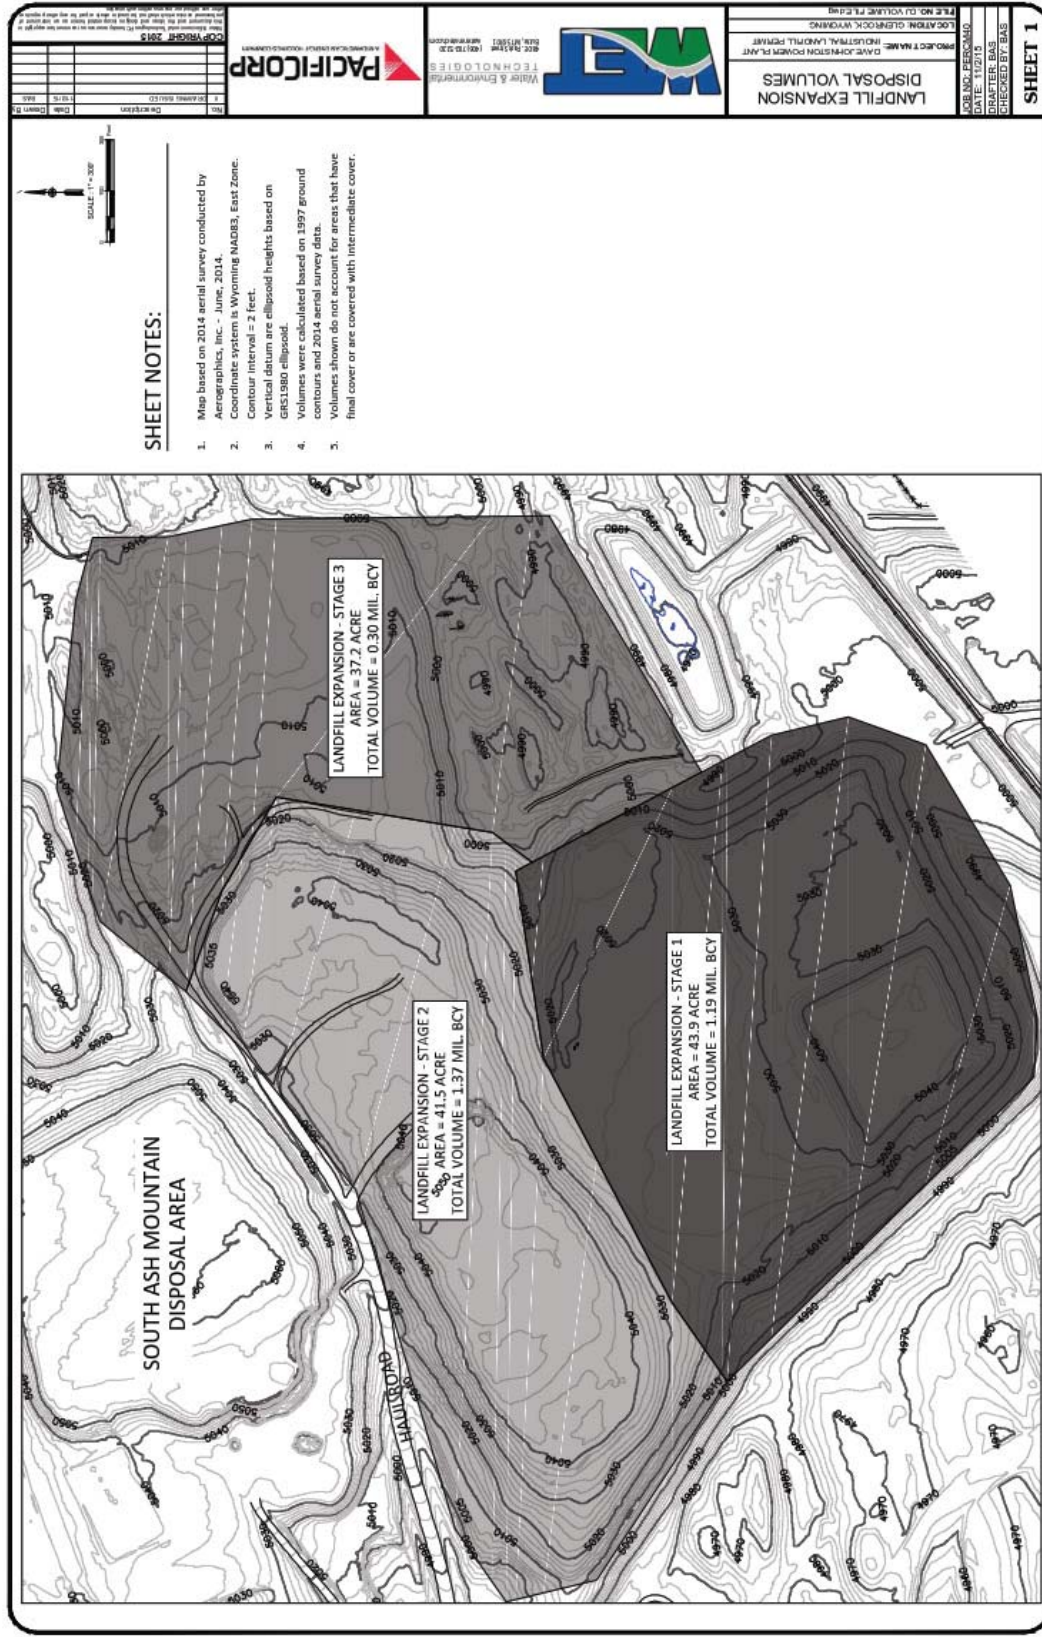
Site Plan and Disposal Volumes for Expansion Landfill [4]
